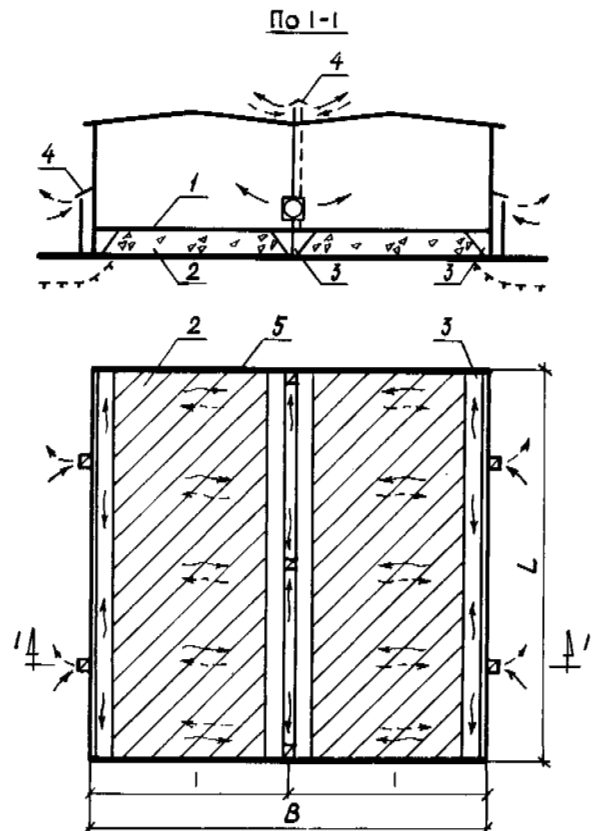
Schematic of a building with a floor over a ventilated fill [pad]. 1--floor with thermal insulation; 2--porous ventilated pad; 3--distribution channel; 4--ventilation shafts; 5--moisture barrier.
